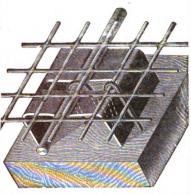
Half-Inch Metal Bearing, Showing Manner of Fastening Rods and Lathing.
